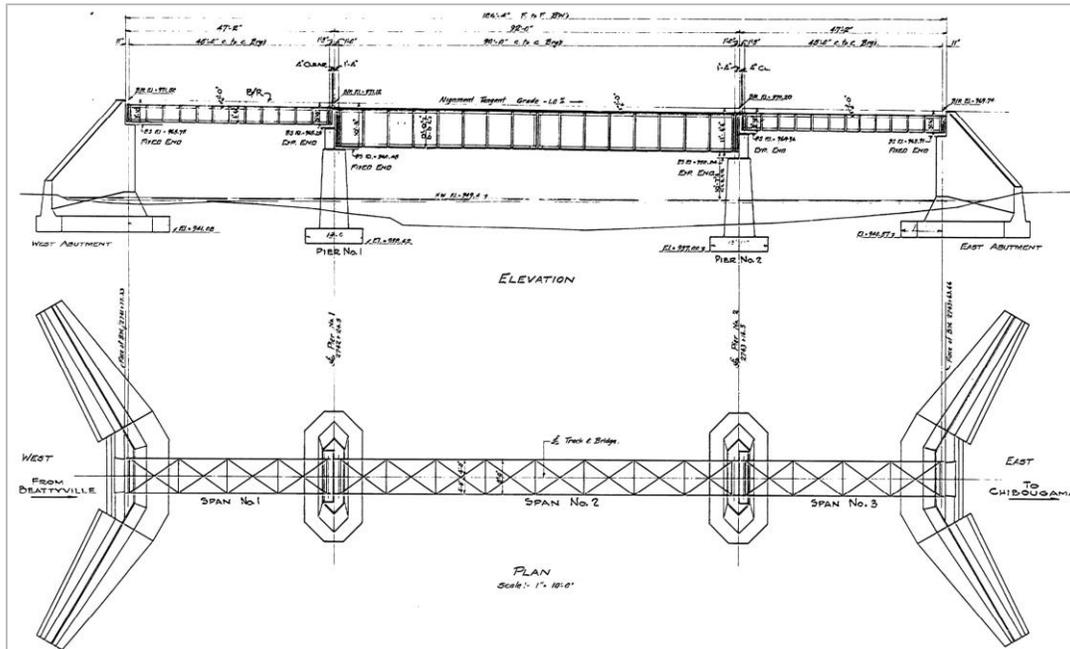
Plan and elevation views of the PK 91.0 Chapais bridge
